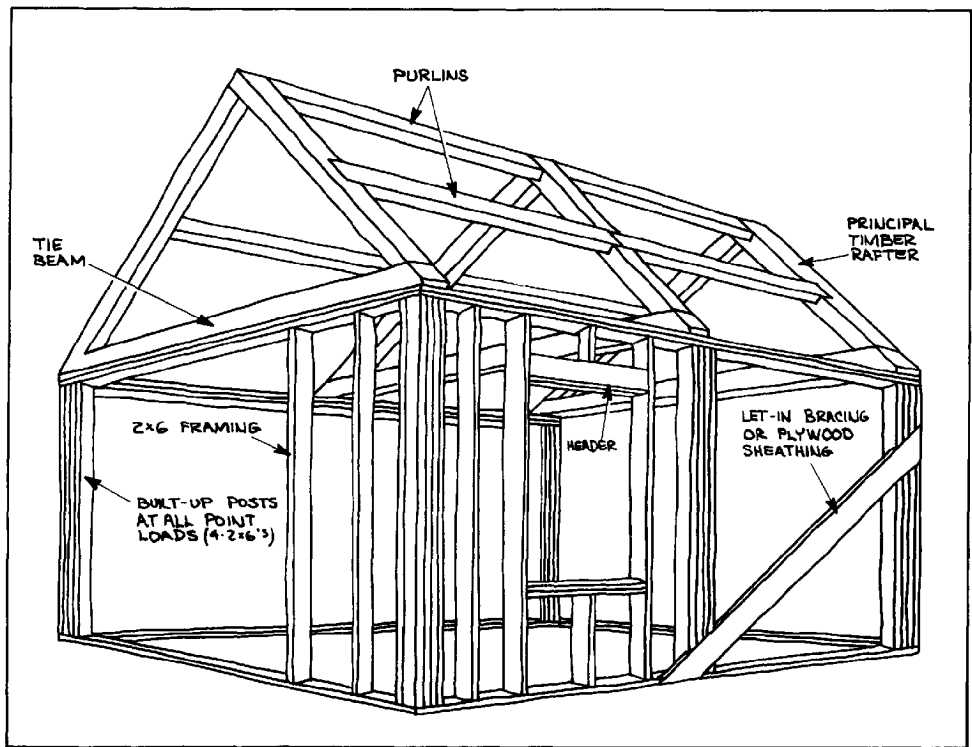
Figure D. Stick-framed walls and timber-framed ceiling and roof. If the second floor and roof are timber-framed properly, they should subject the first-floor walls to vertical loading only. Use minimum 2x6 stud walls in this type of hybrid, and use multiple studs under rafter ends.
